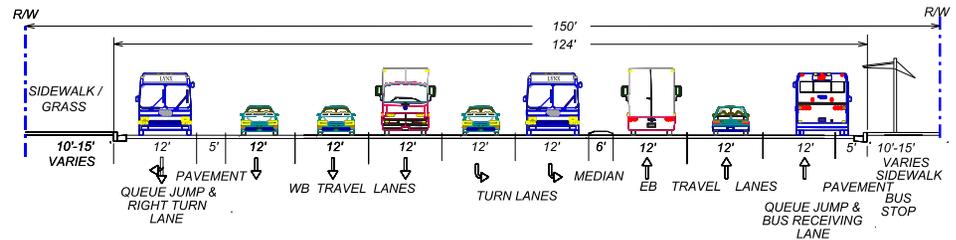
Proposed Typical Section at Hiawassee Road Queue Jump Station
